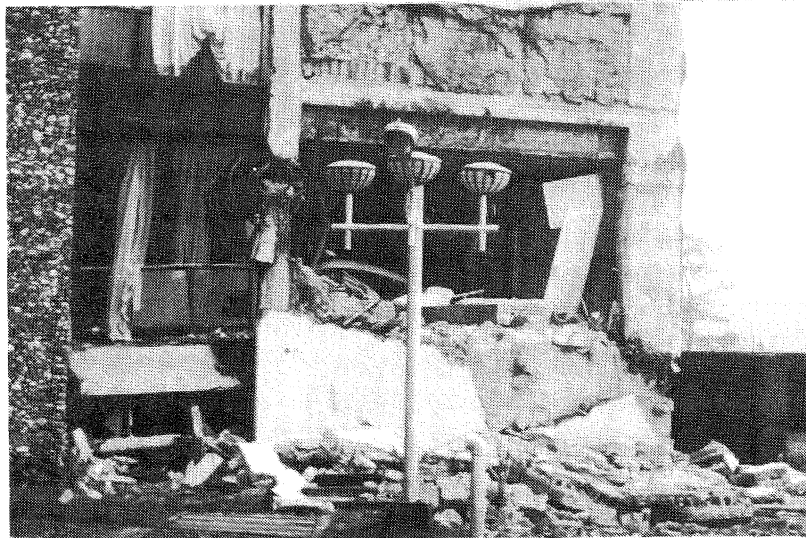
Montepinos Apartments, Baguio; failure of infill block panels and adjacent columns
